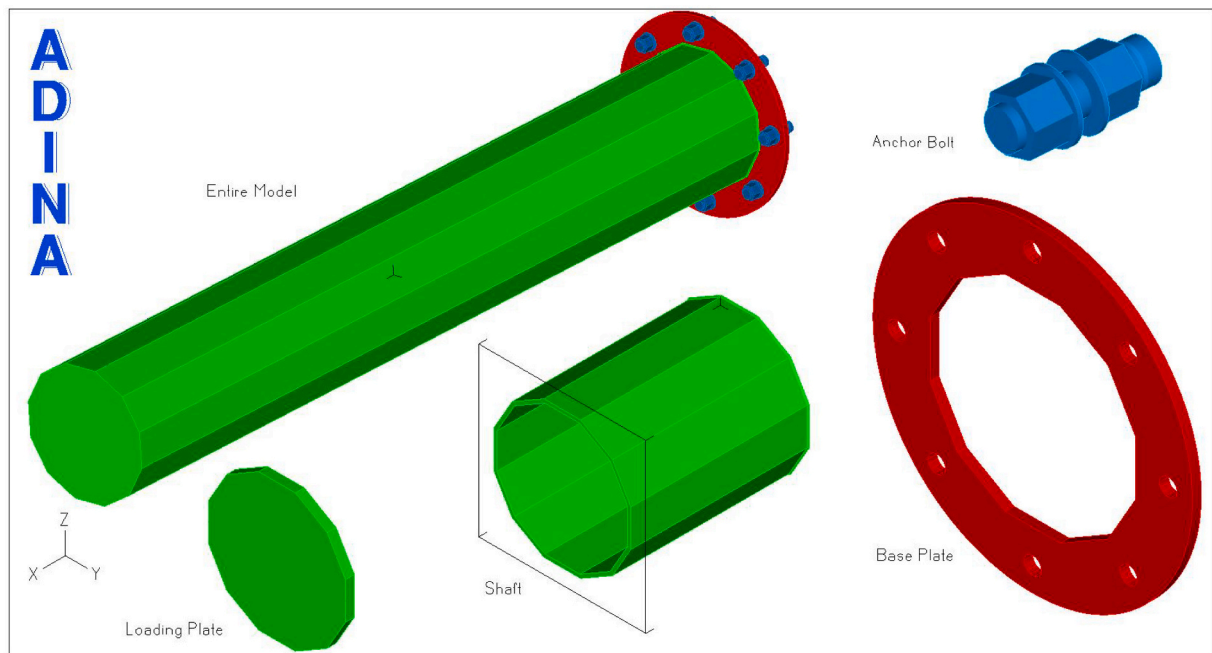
Three Dimension View of the Finite Element Model Used in the Study.
